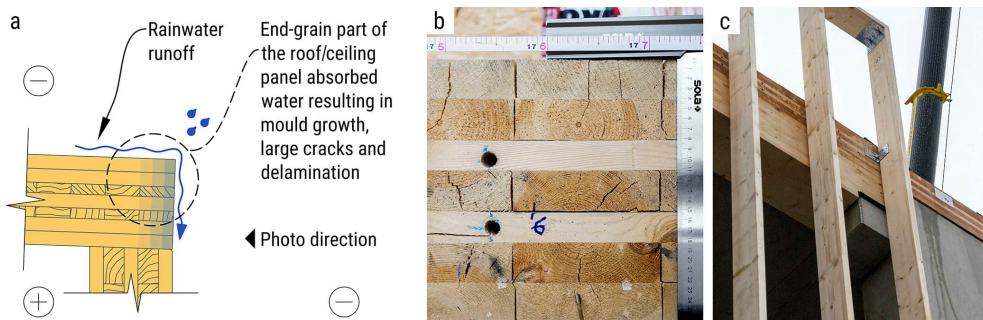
CLT roof connection (a), where large cracks (b), delamination, and mould growth occurred after frequent wetting (c) and subsequent moisture dry-out. Photos of building A.
